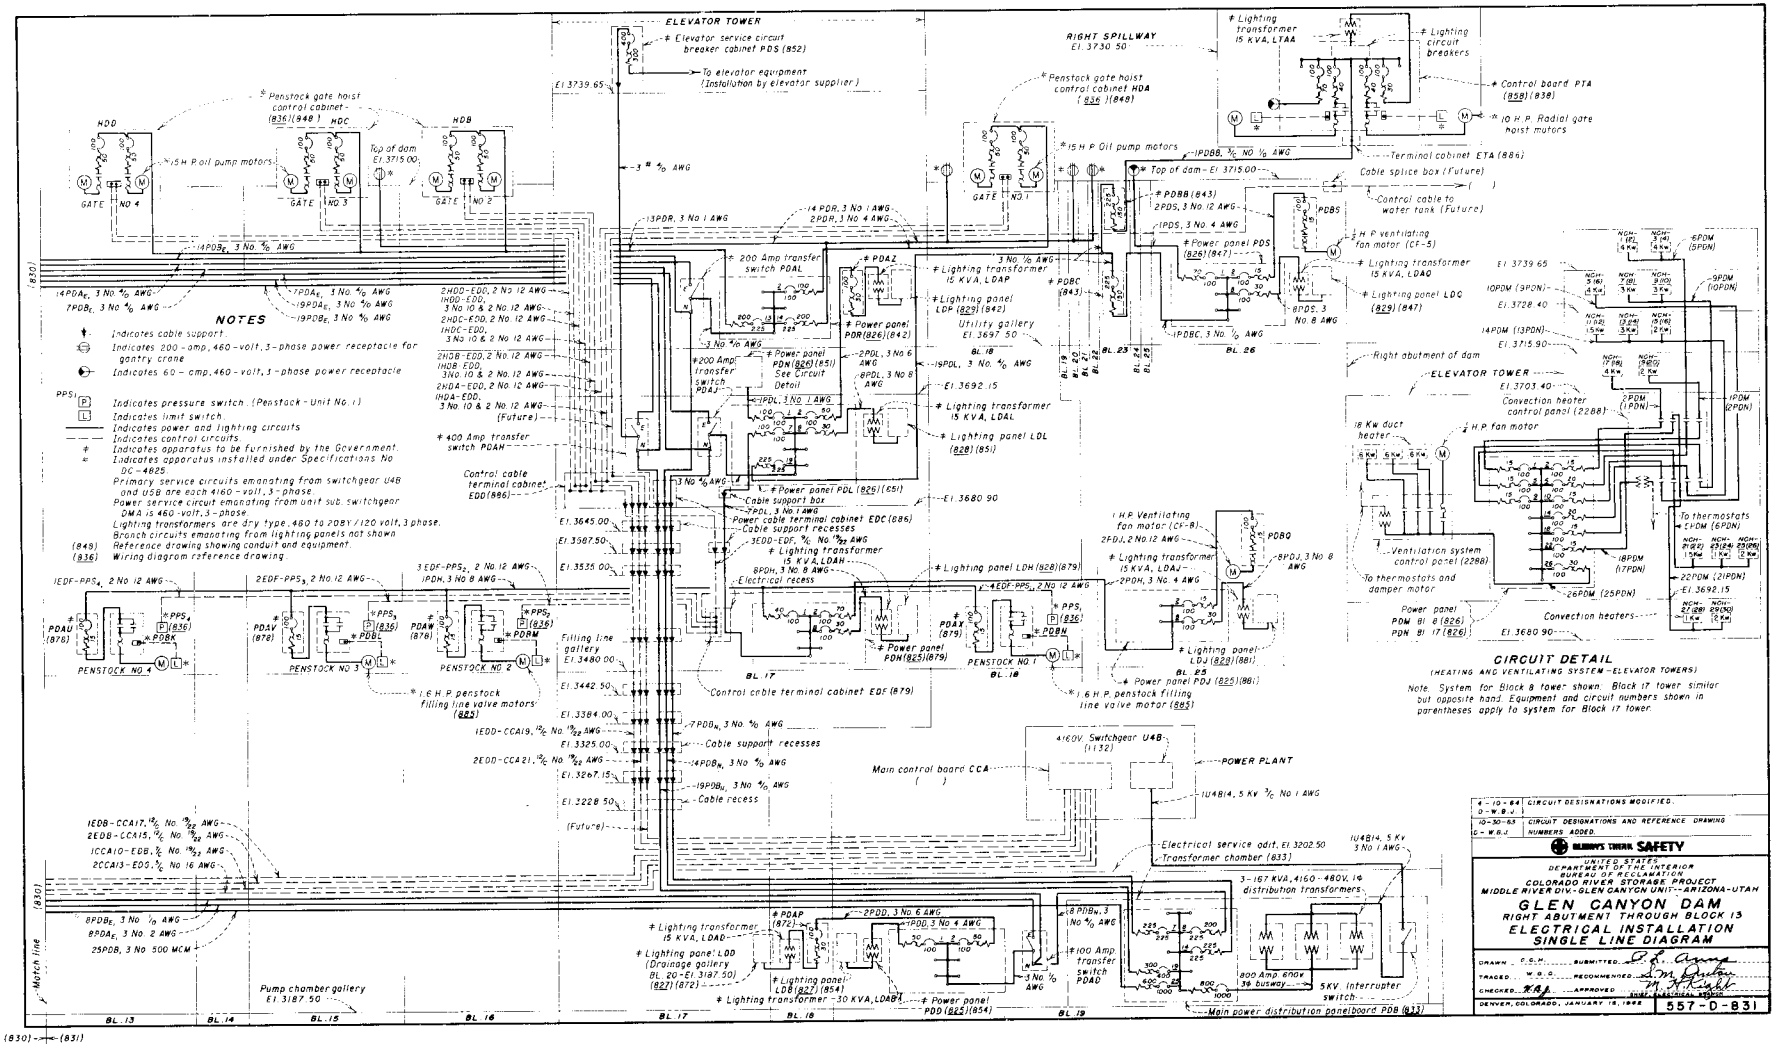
Single-line diagram of electrical installation in dam—Right abutment through block 13.
